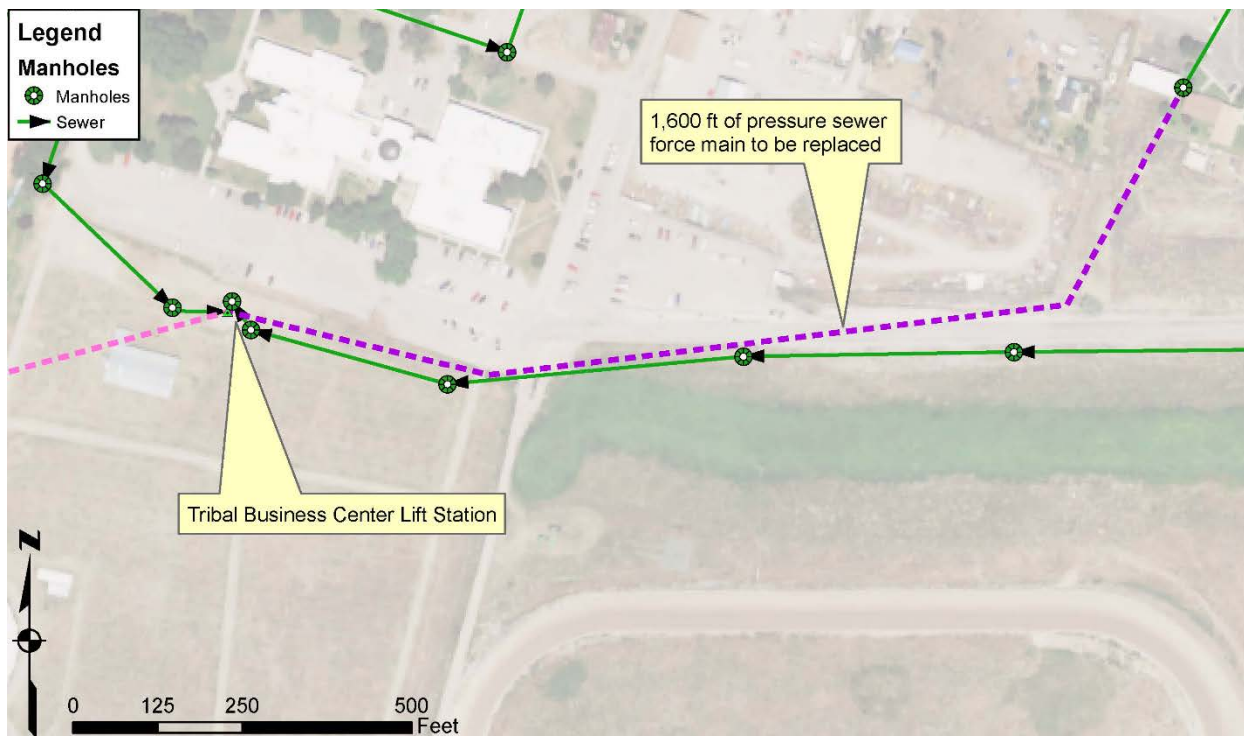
Location of Tribal Business Center Lift Station and force main sewer lines to be replaced in Fort Hall, Idaho.
